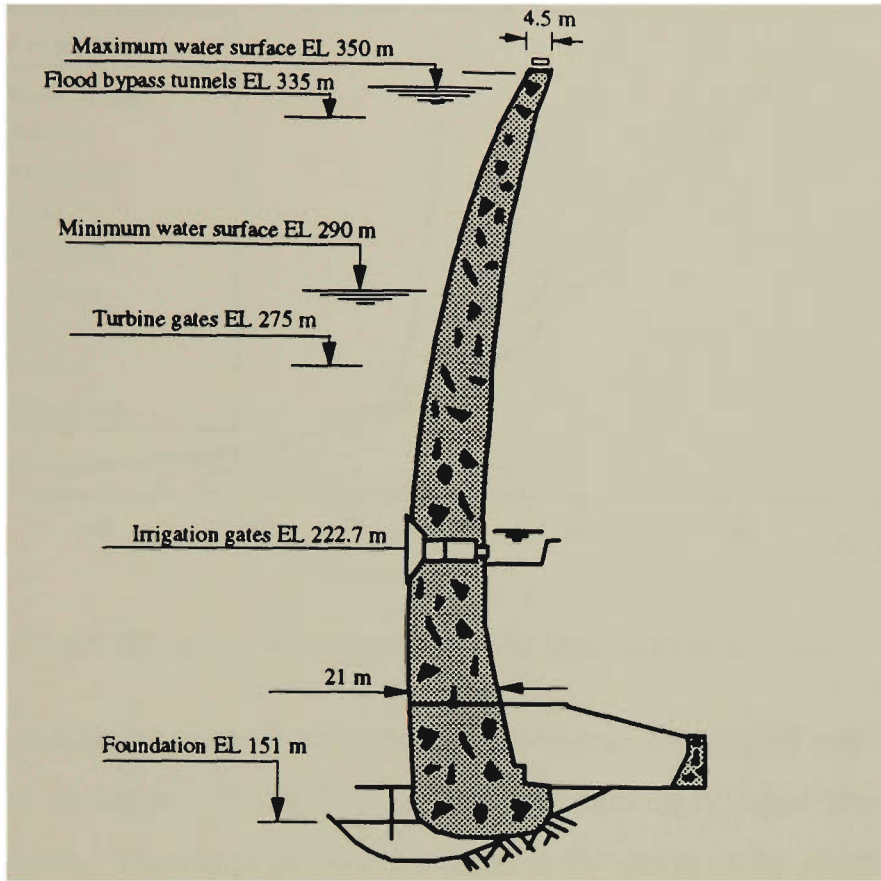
Dez Dam cross-section and important elevations (Khozestan Water and Power Authority, 1983).
